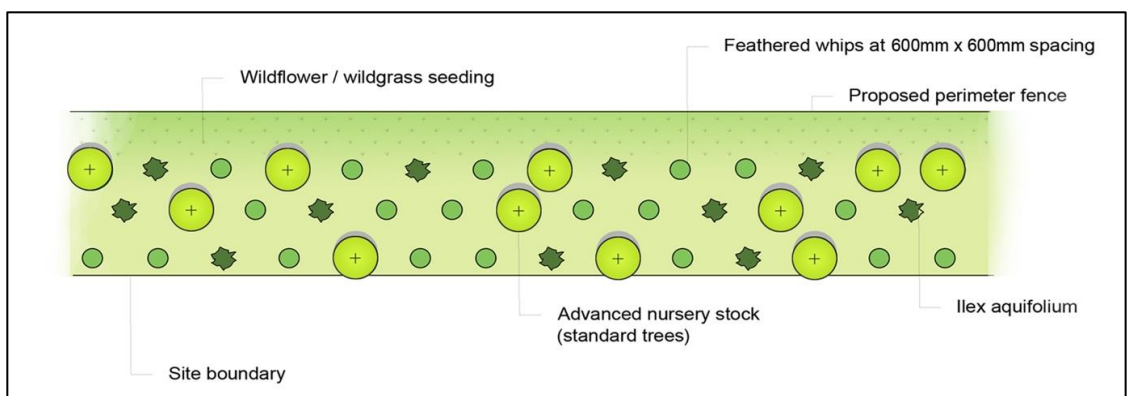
Indicative boundary planting detail showing the introduction of new boundary hedgerow TYPE 2
